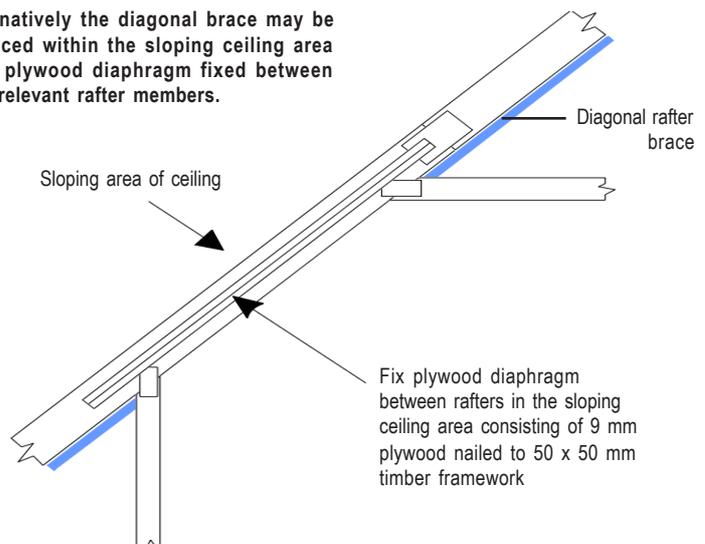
Detail X - Alternative methods of incorporating rafter bracing in sloping ceiling area.
